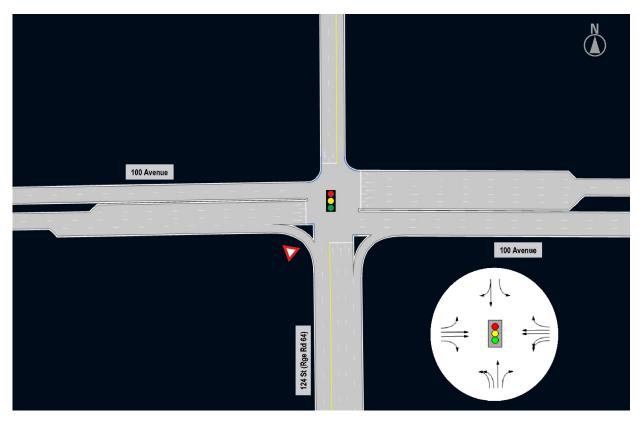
Proposed 100 Avenue & 124 Street / Range Road 64 Upgrades
